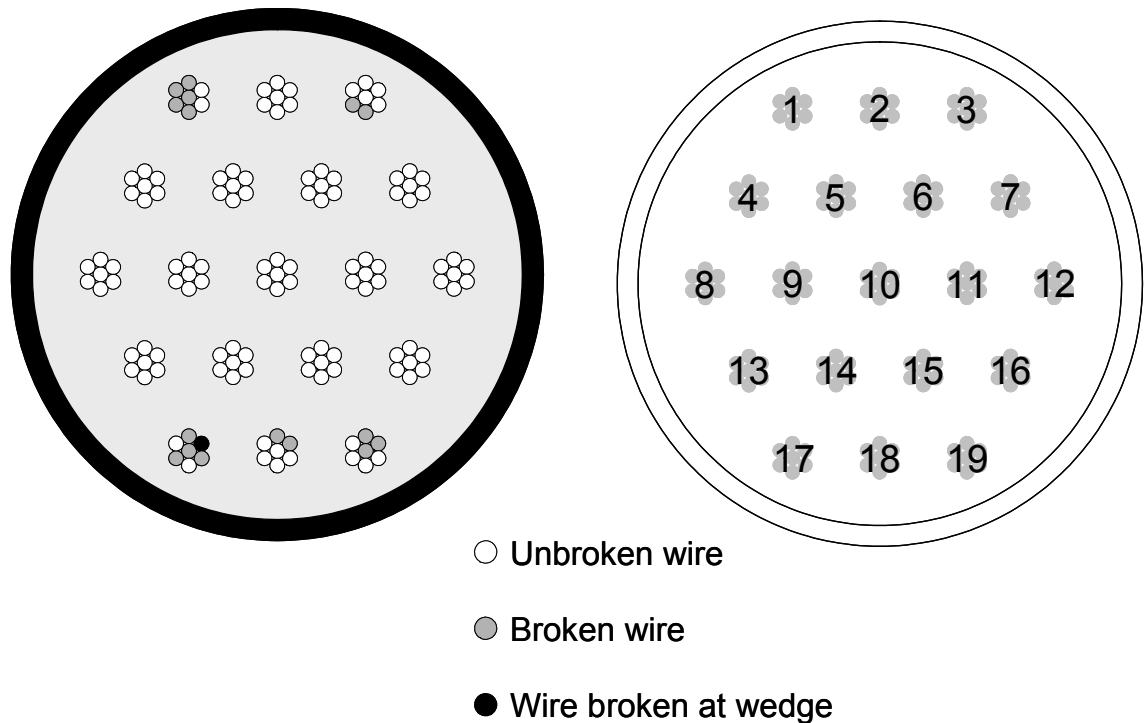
Wire breaks at the deck anchorage - Specimen 7
